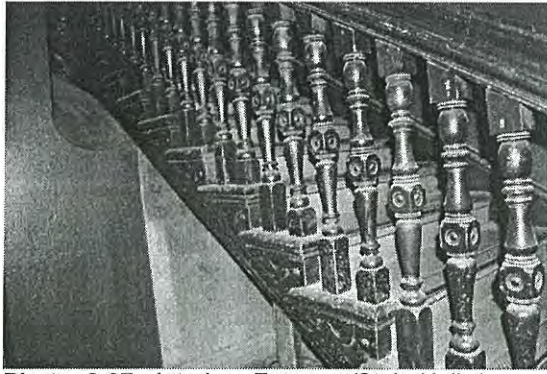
Interior, Entrance/Stair Hall (space FG05). Original timber staircase detail.
